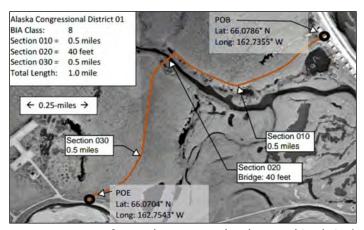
Project specifications showing proposed road route and Smith Creek crossing.
